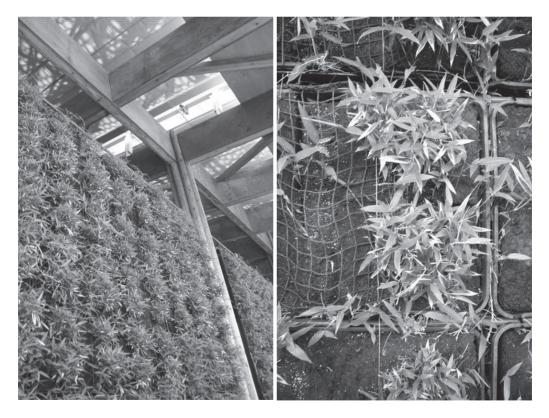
Details about the construction of the vertical garden and the drip irrigation on the exterior wall of the Japanese Pavilion in the World Exposition in Aichi
